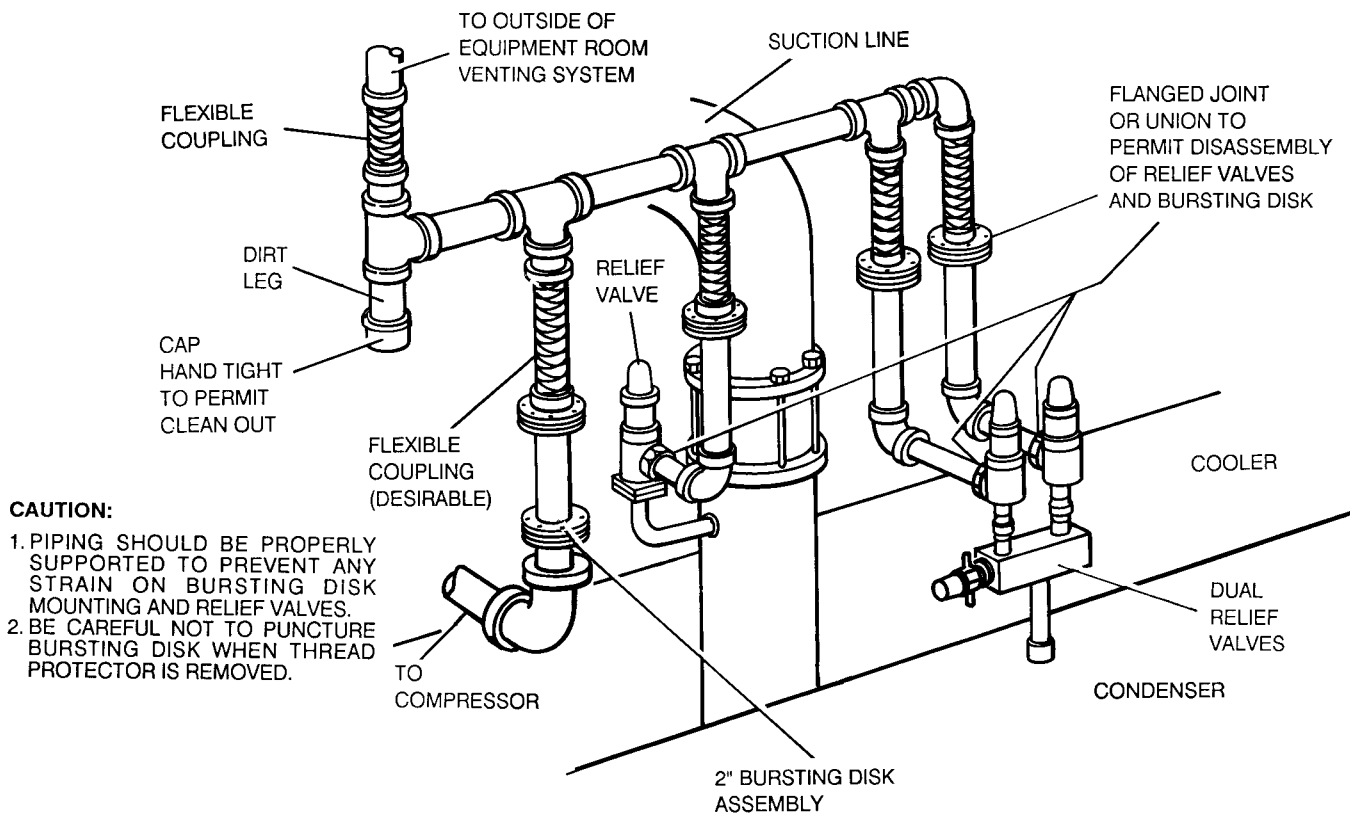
TYPICAL REFRIGERANT VENT PIPING
